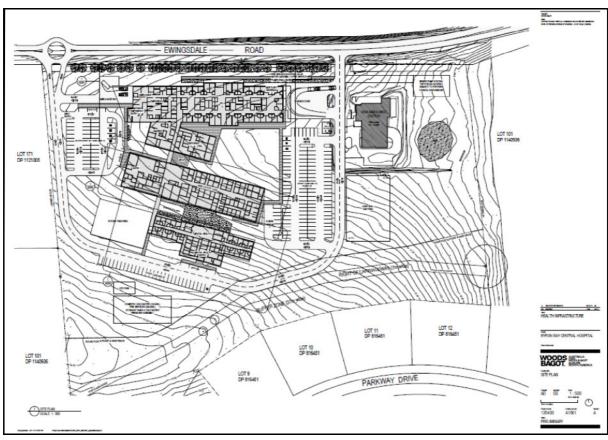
Site plan showing location of the proposed hospital (larger image in Appendix A)
